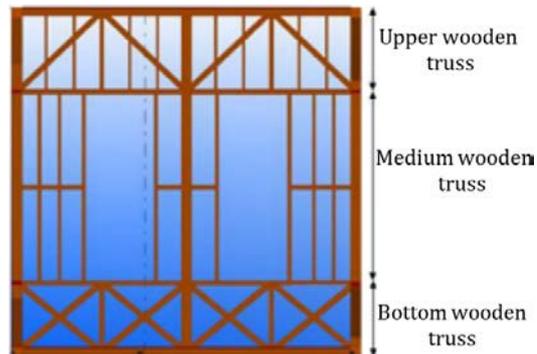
Çatki wall layout for one storey of the timber structure (Kaplan 2013).
